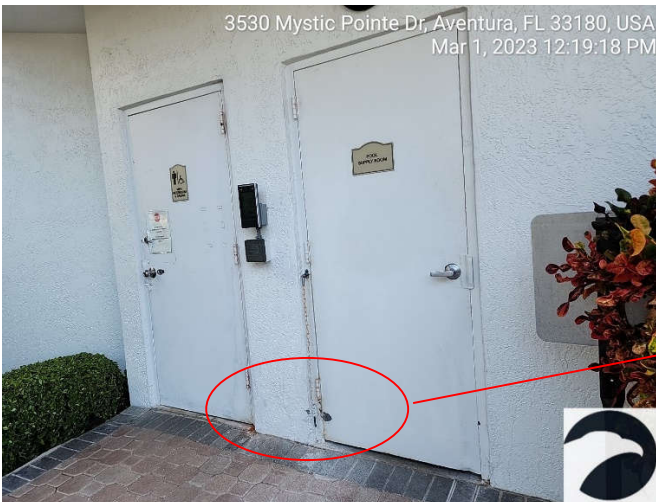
a.9 – Corroded doors of the Bathroom and Pool Equipment Room (Ground Level)
